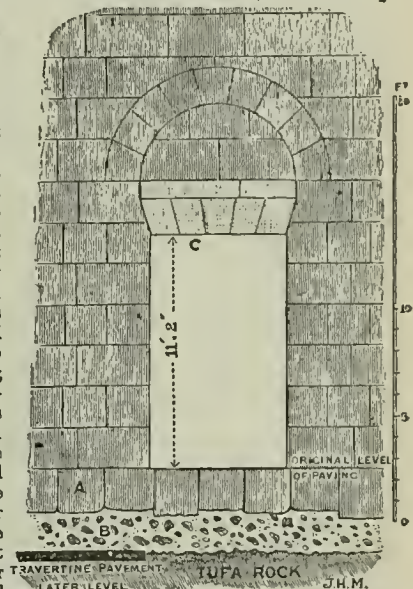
Example of *opus quadratum*, 78 A.C. Arch at foot of the stairs of the Tabularium (see Plate VI.). The flat arch C is of travertine, the rest of peperino. A. Footing-course of rough stones. B. Concrete foundation, exposed by the lowering of the paving when the temple of Vespasian was built.
